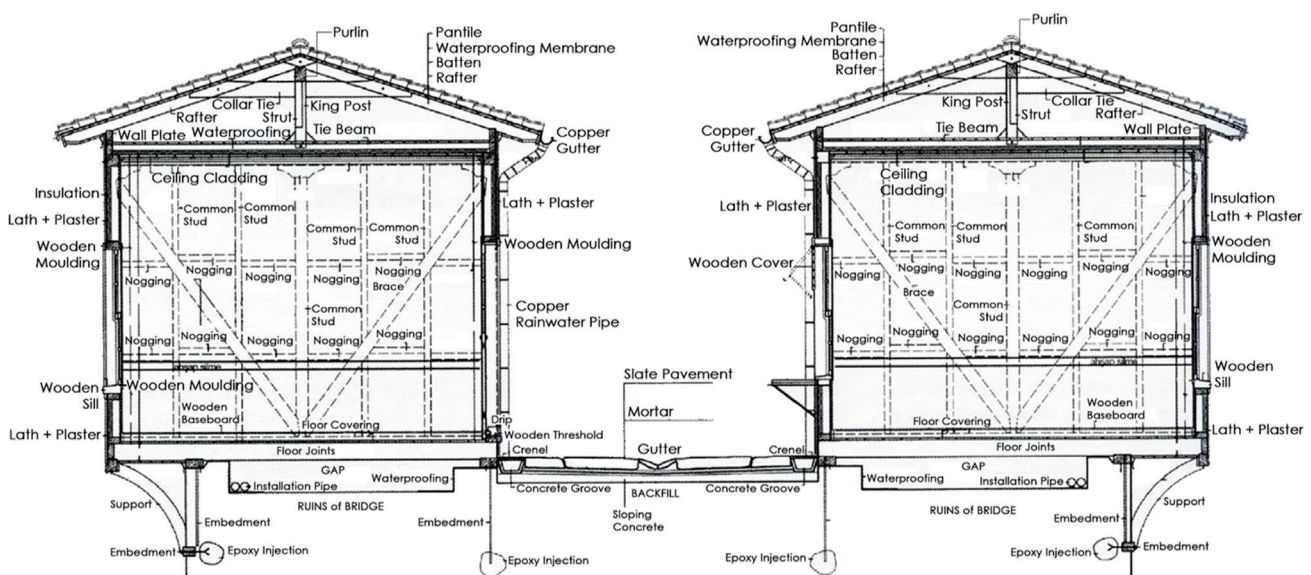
Section of wooden shops on Irgandi Bridge [16, 17]
